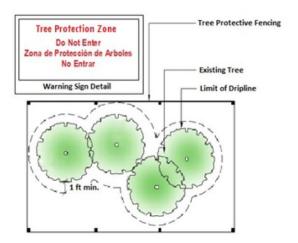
J.2: Tree Protective Fencing and Signage.
